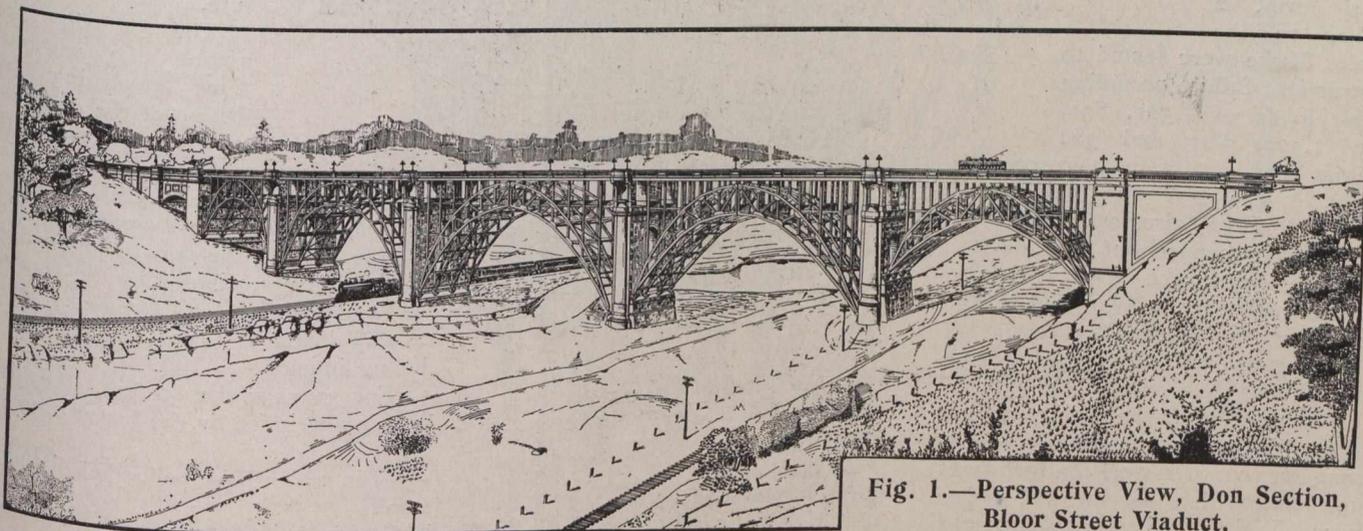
Perspective View, Don Section, Bloor Street Viaduct.
